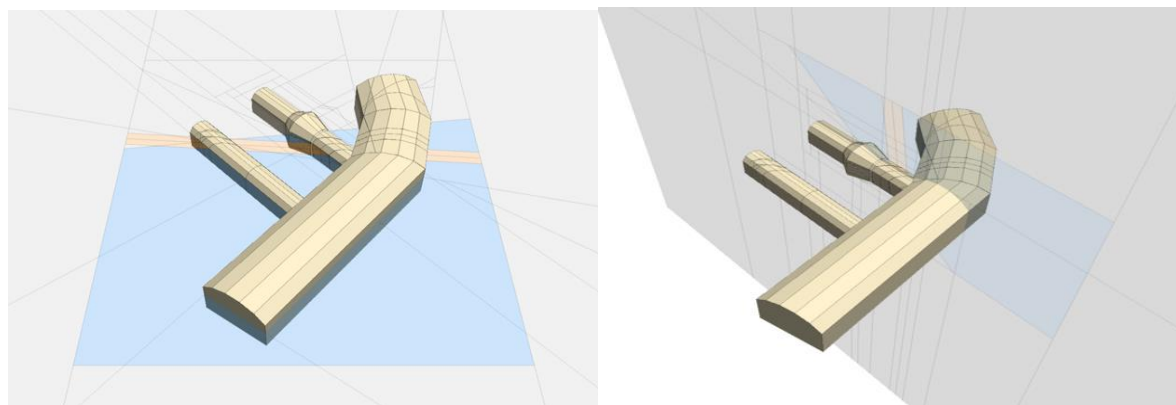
Horizontal and longitudinal section locations © Posiva
